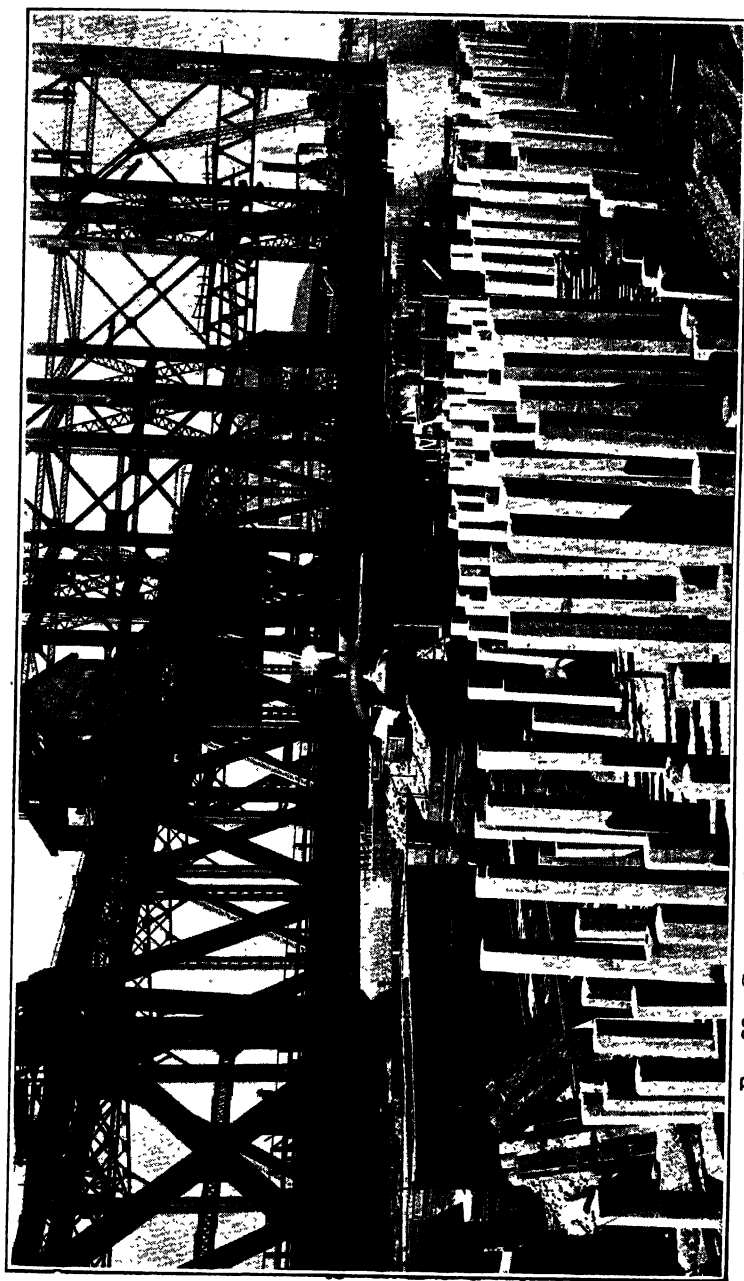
Concrete piles in foundation for New York Central bridge at South Chicago.
